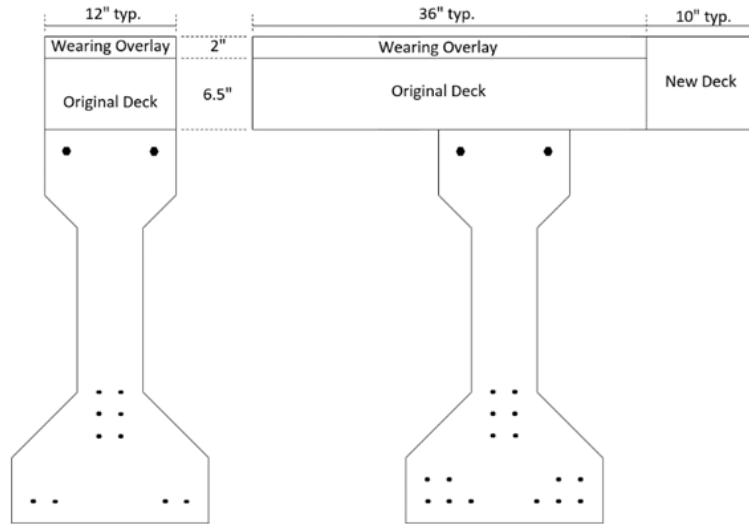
Deck details as tested for girder A (left) and girder C (right)
